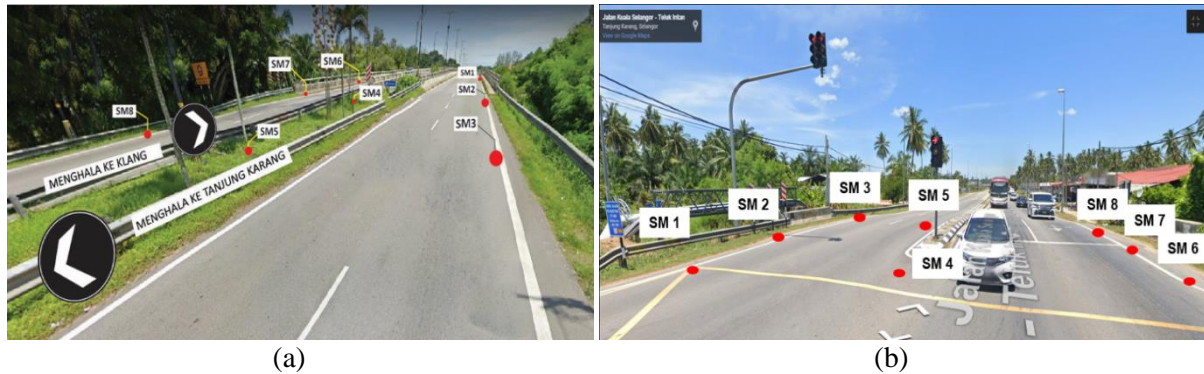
The photos show the arrangement of settlement markers located at (a) Bridge of SSAA; and (b) Sg. Gulang-Gulang Box Culvert.
